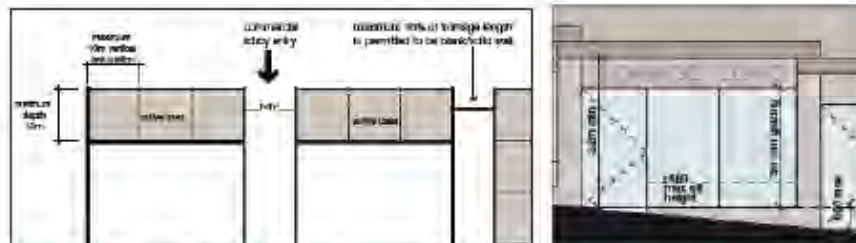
Active Frontages plan diagram and Active Frontages elevation diagram
